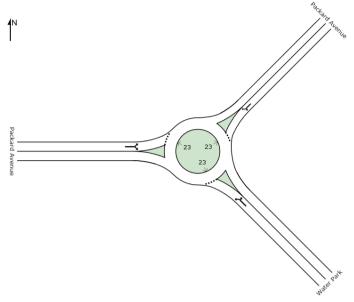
Sidra Model Layout Chung Wah Terrace Extension / Packard Avenue
